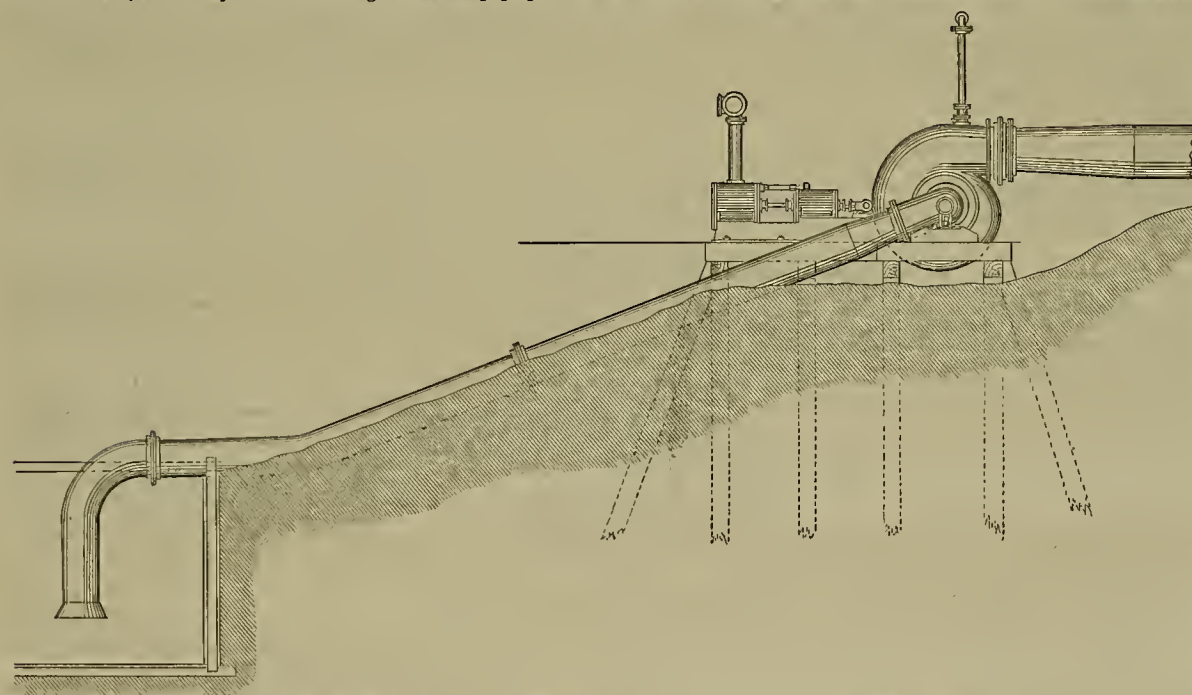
SIDE ELEVATION OF PUMPING PLANT AT C-D ON THE PLAN.
